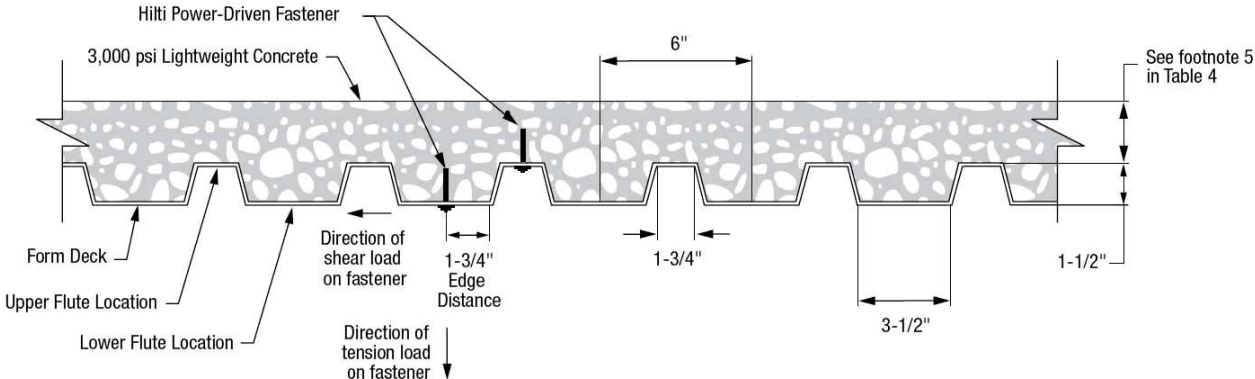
HILTI FASTENER LOCATIONS IN 1 1/2-INCH-DEEP COMPOSITE FLOOR DECK, INVERTED DECK PROFILE ORIENTATION
